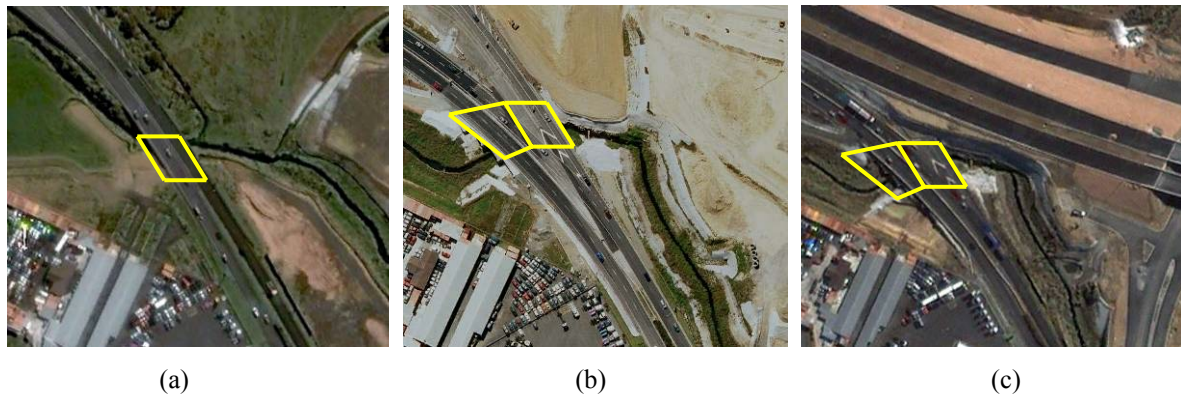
Changes to Puhinui Stream Bridge site during SH20 bypass is constructed (a) September 5, 2007, (b) April 4, 2009, (c) April 7, 2010
